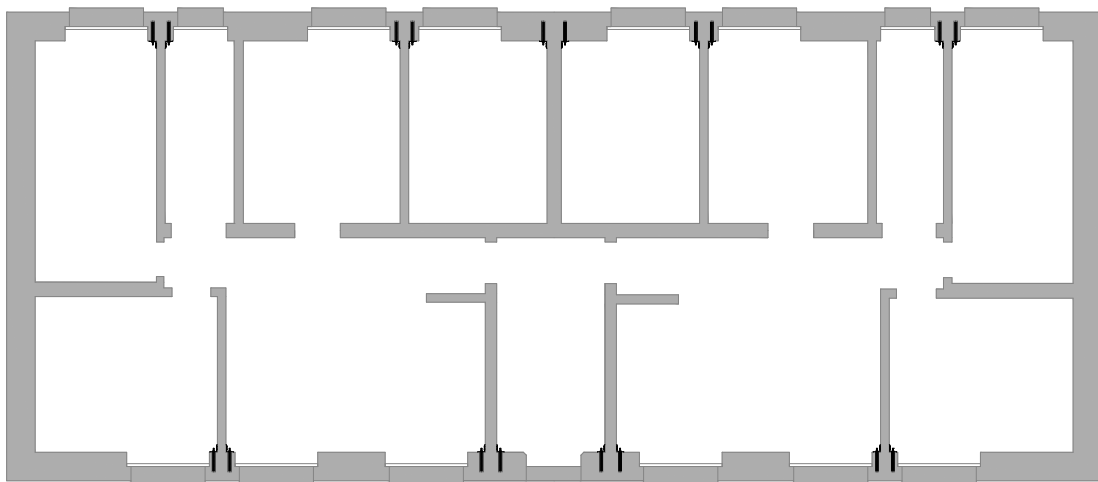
Schematic representation of the wall-to-wall strengthening solution in each floor level.
